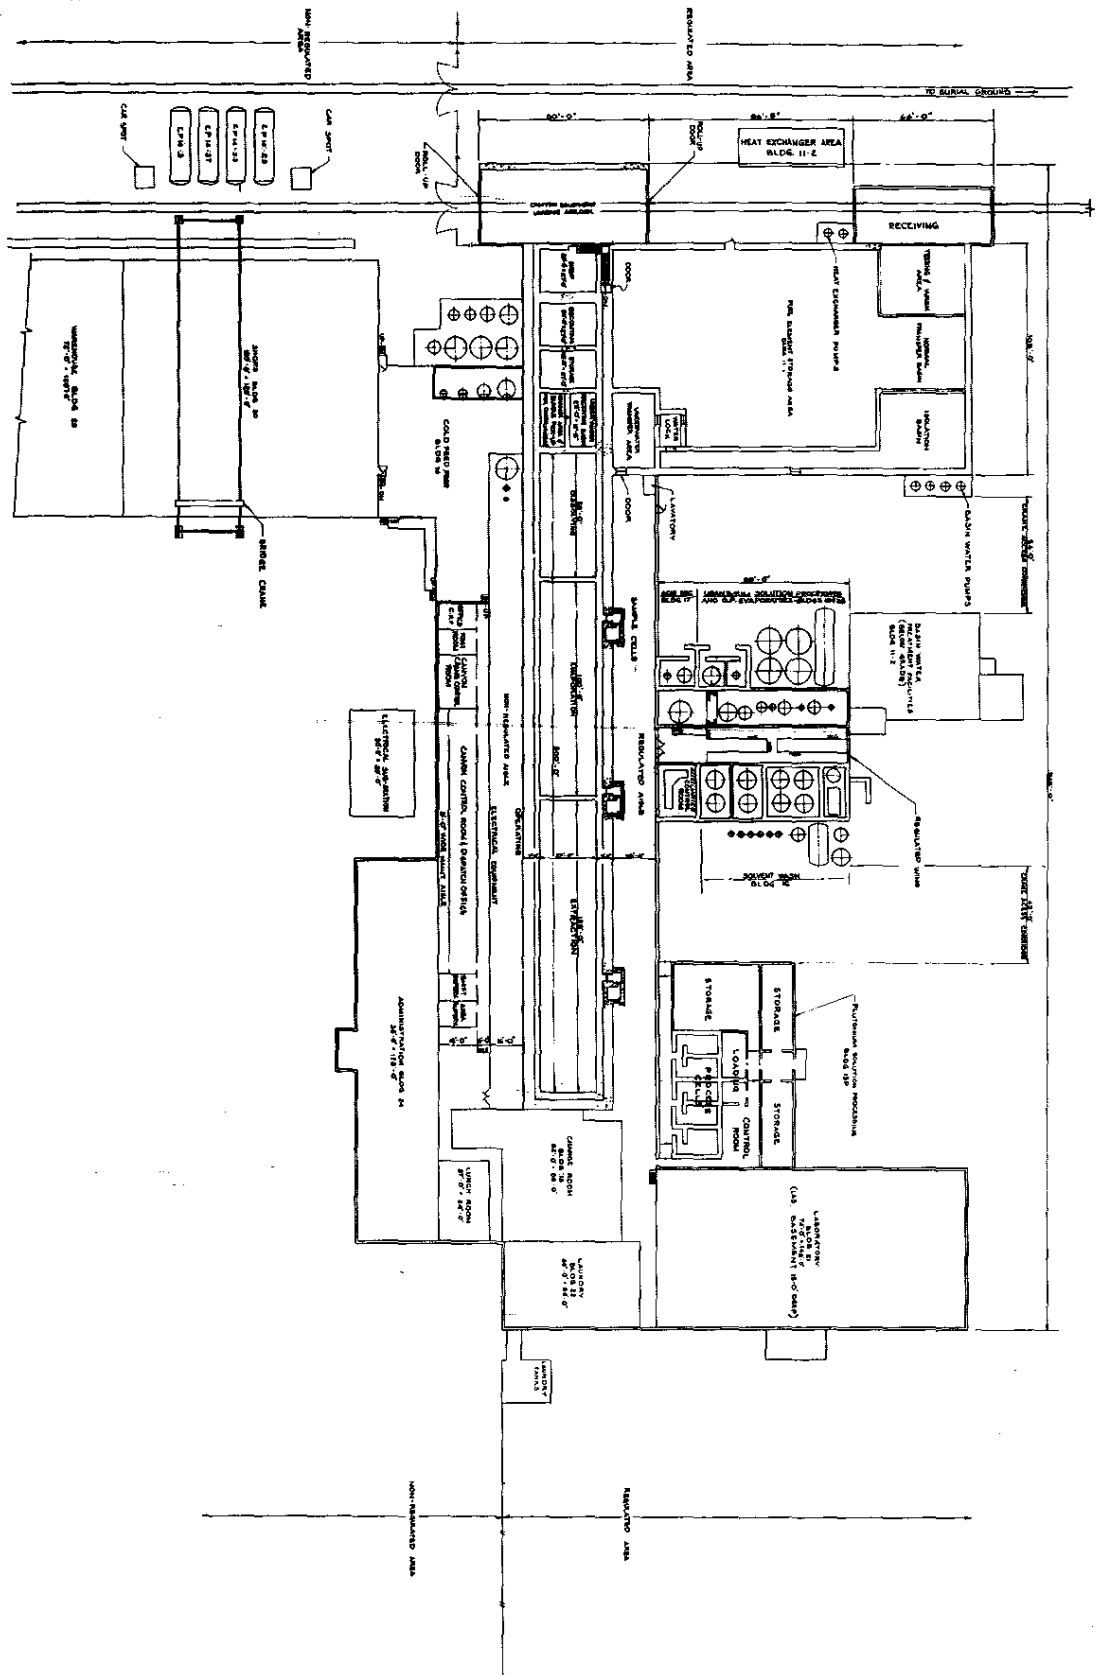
CASE 1 - ALL BUILDINGS - GENERAL ARRANGEMENT
